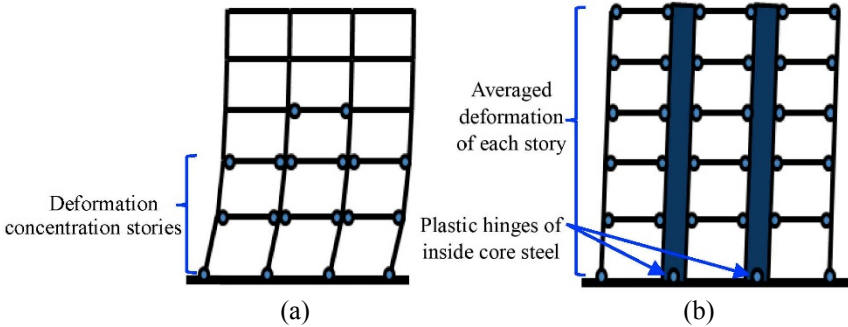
Plastic hinge formation mechanisms. (a) Conventional steel frame; (b) Hybrid tuber building.
